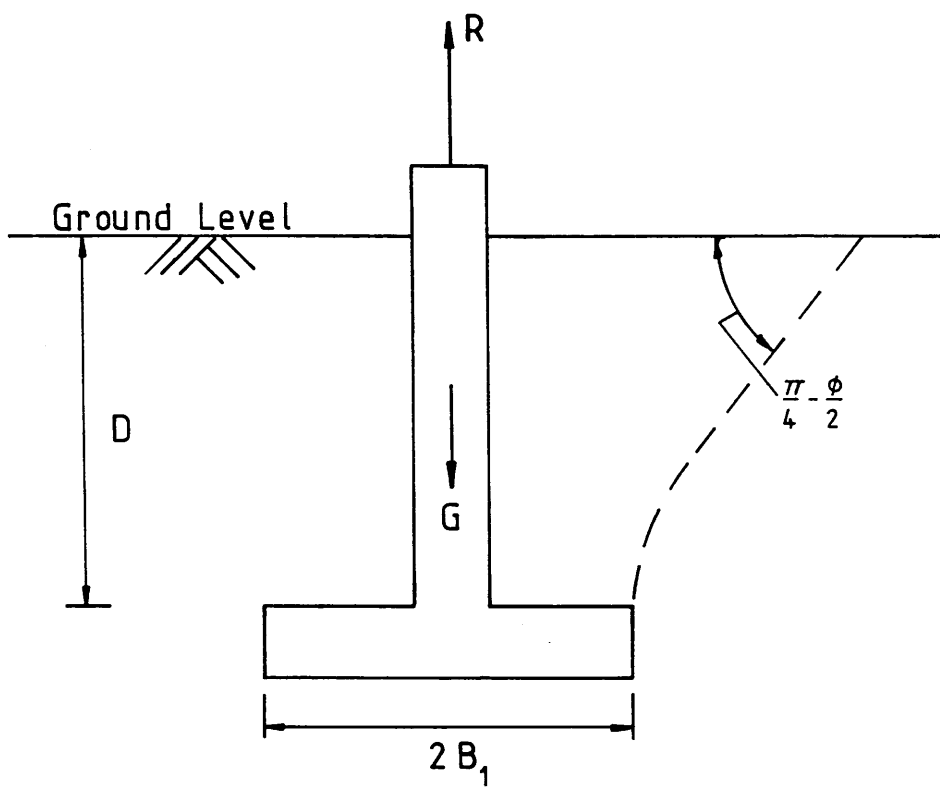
Shallow anchor failure surface after Matsuo (1967).
